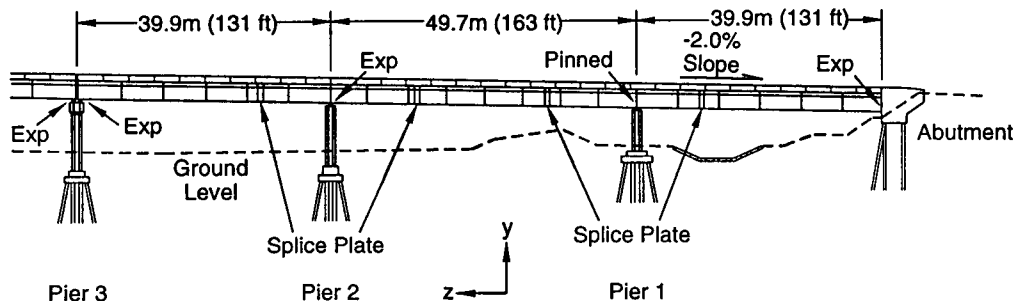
Elevation view of the portion of the I-40 Bridge that was tested.
